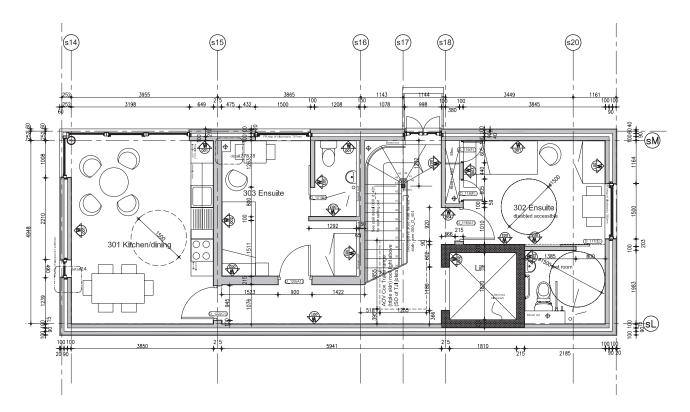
Spring Gardens: Third Floor Plan (communal rooms, self contained accommodation)
